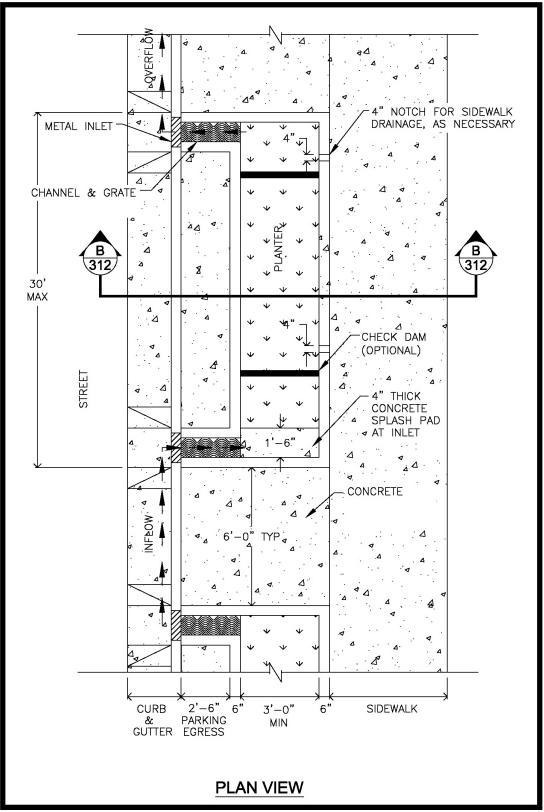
Green Streets Planter Plan View With Parking (source: Portland, 2011)
